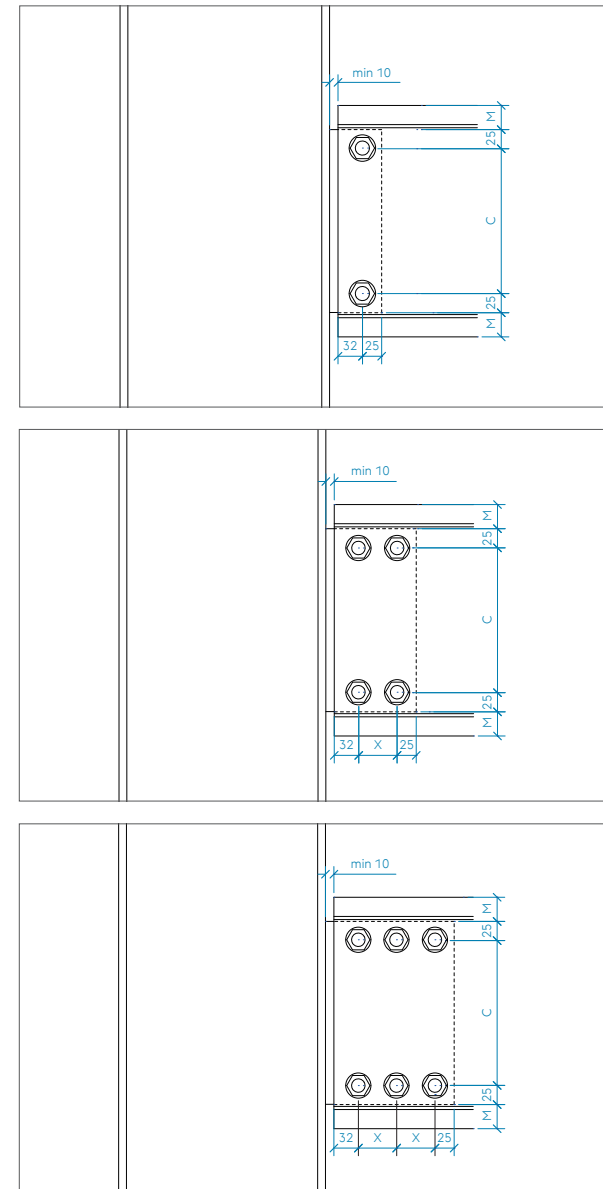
Girder connection to the column using one to three pairs of bolts
